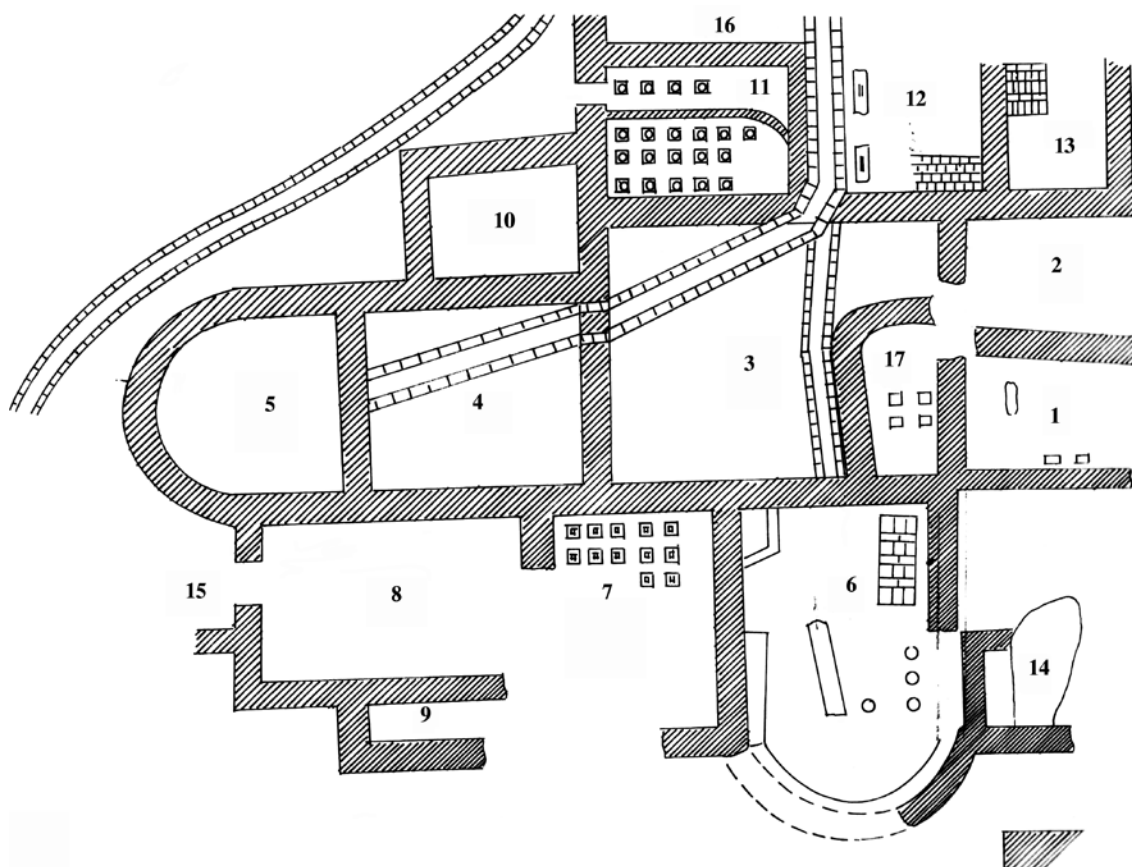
Building in the foundations for a block of flats Dunav B 11 at Seres str.
